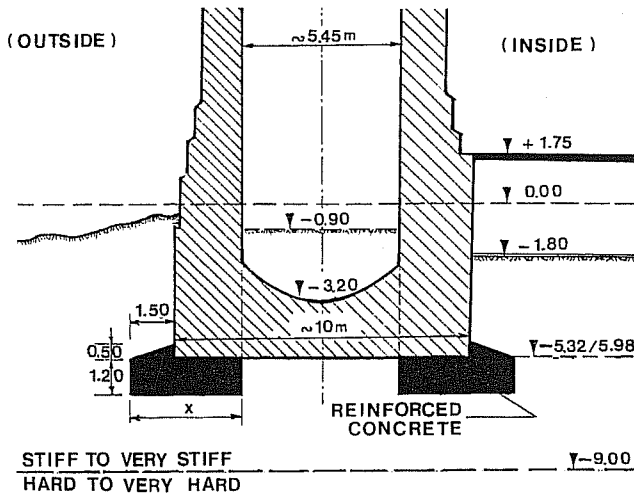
ENLARGEMENT OF FOUNDATION AREA
